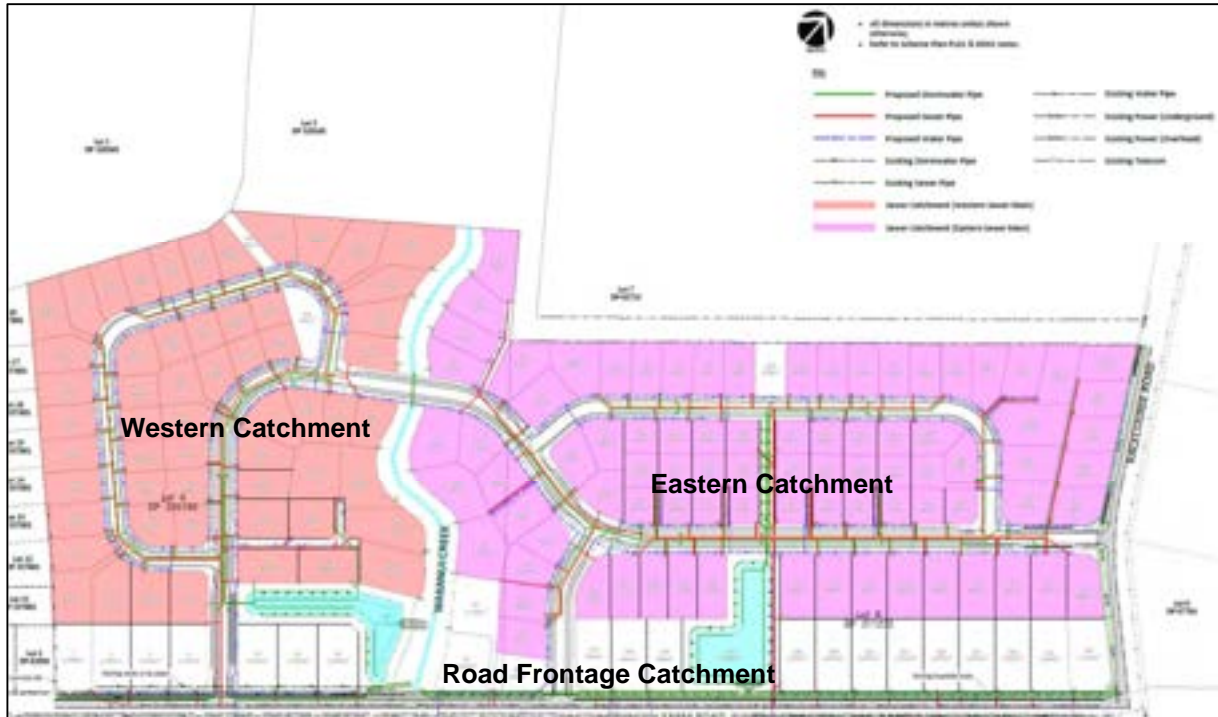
Proposed conceptual wastewater sub-catchments, connections and network within the site
